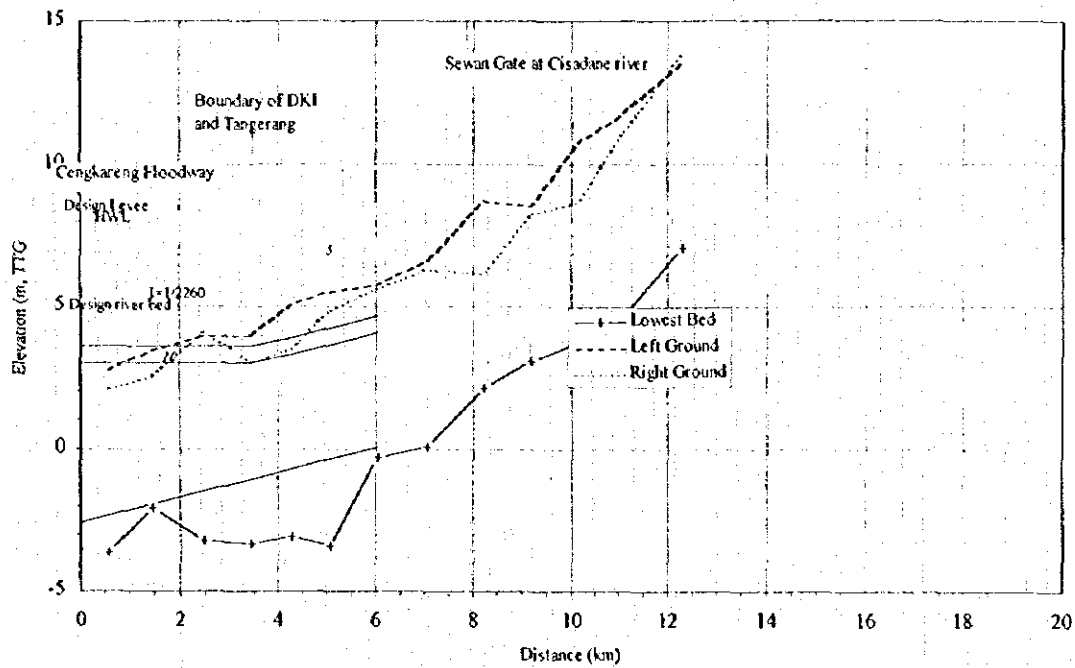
PROPOSED LONGITUDINAL PROFILE AND CROSS SECTION (5/13)
